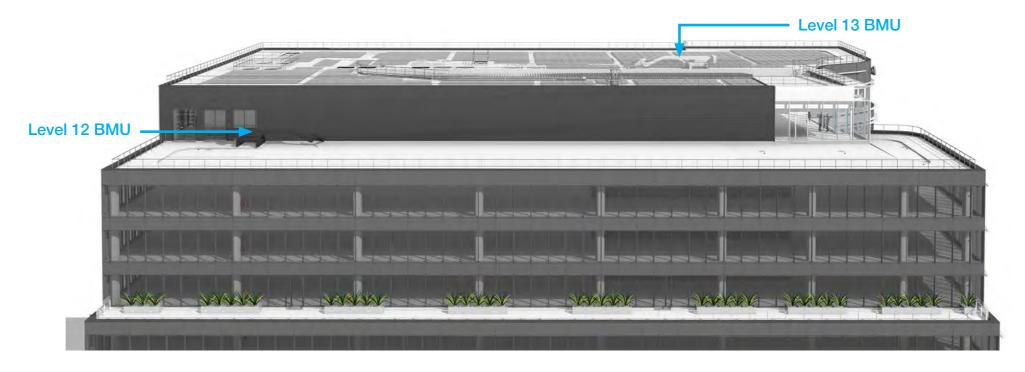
Section 96 NW Plot proposed Roofscape showing parked BMUs and required safety handrails
